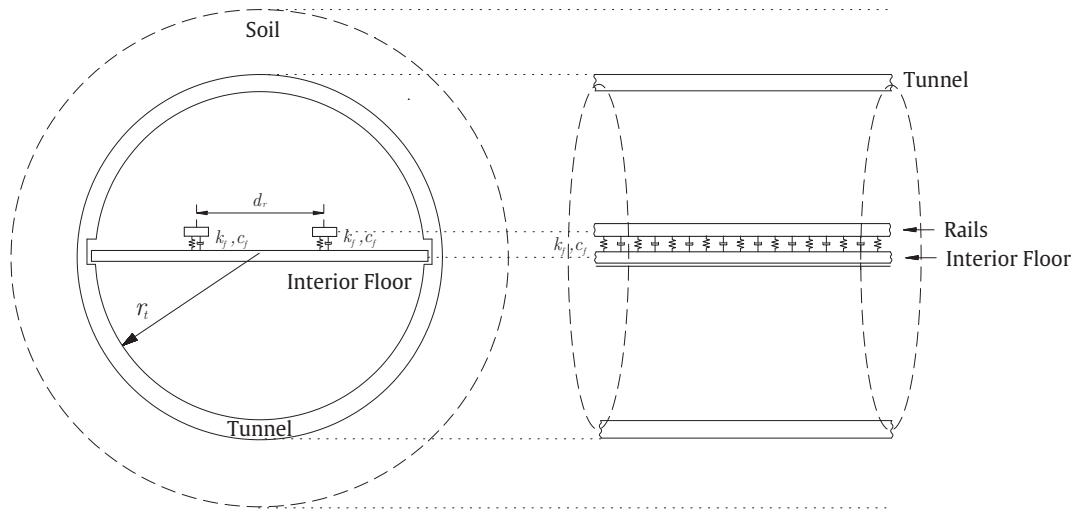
A scheme of a double-deck tunnel and its subsystems embedded in a full-space.
